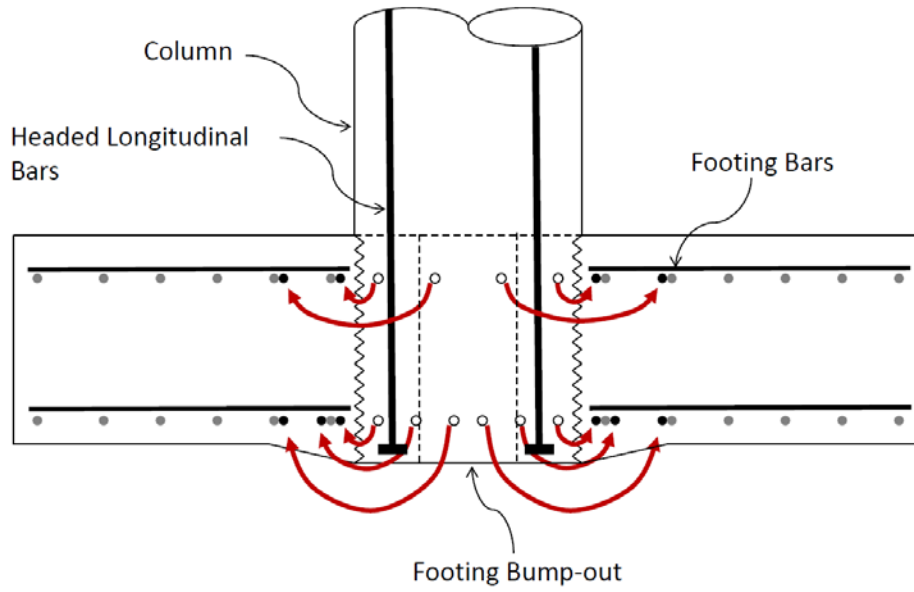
Diagram. Adjustment of footing flexural reinforcement.
